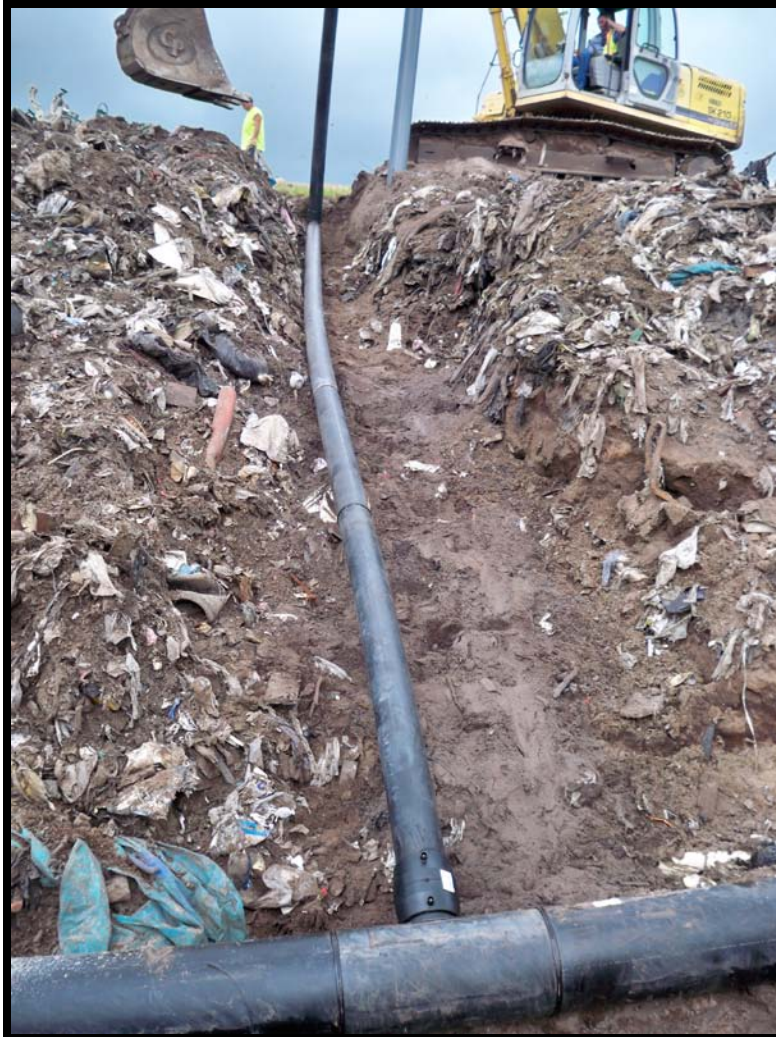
Looking west, lateral road crossing going to GW-54. Backfilled road crossing with stone.
